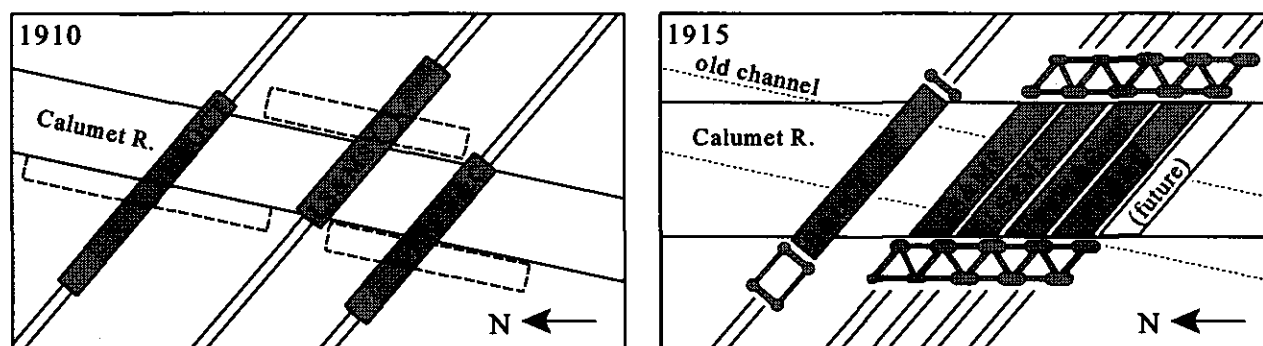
Conditions at Calumet River crossing, before and after bridge replacement. Sketch by author.
